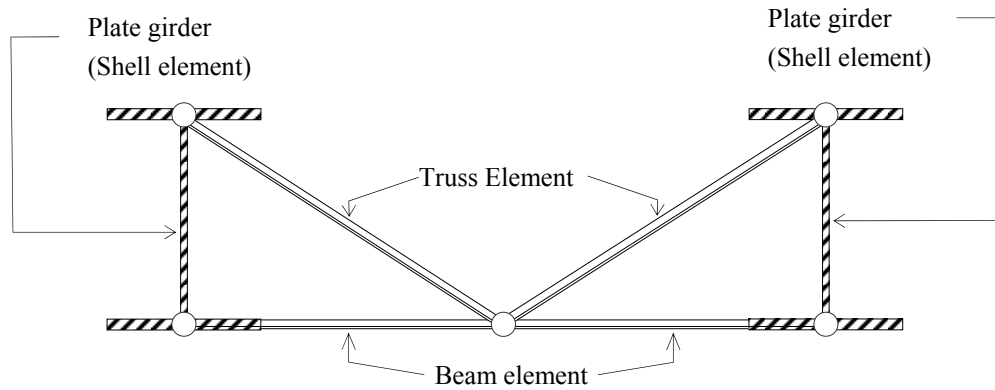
Truss diaphragm as assumed for FE model (not drawn to scale).
